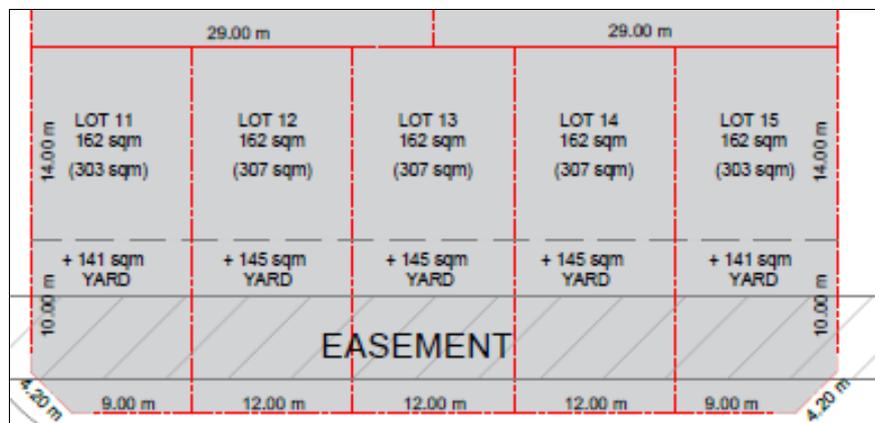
Indicative subdivision plan illustrates a 10m front setback of lots proposed to be an easement to provide for the sewer alignment.
